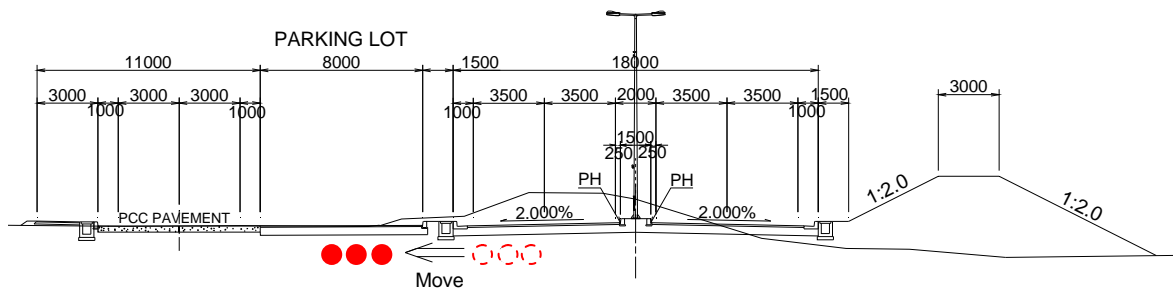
General settlement plan for Engineering & technical lines and networks in Baruun Teevershid street
